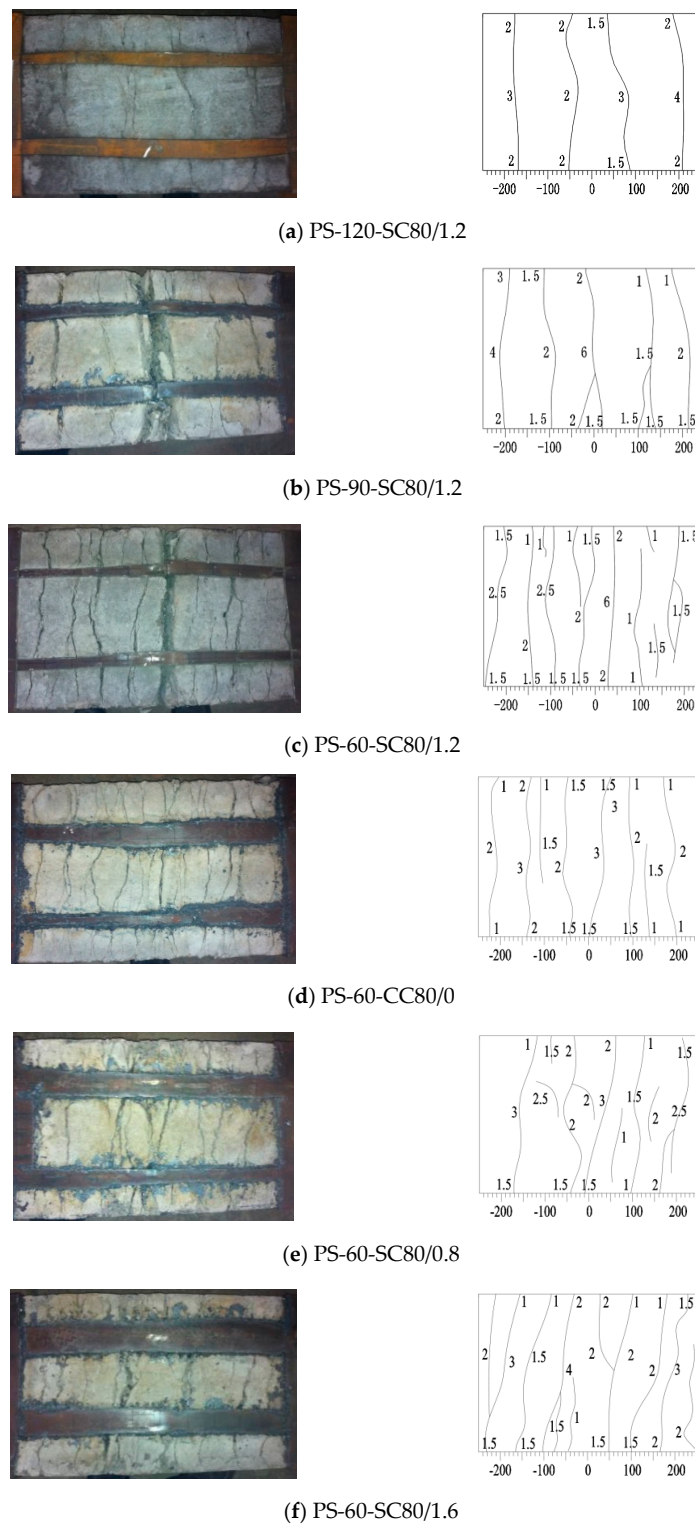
Failure modes and crack distribution of the infill concrete (unit: mm).
